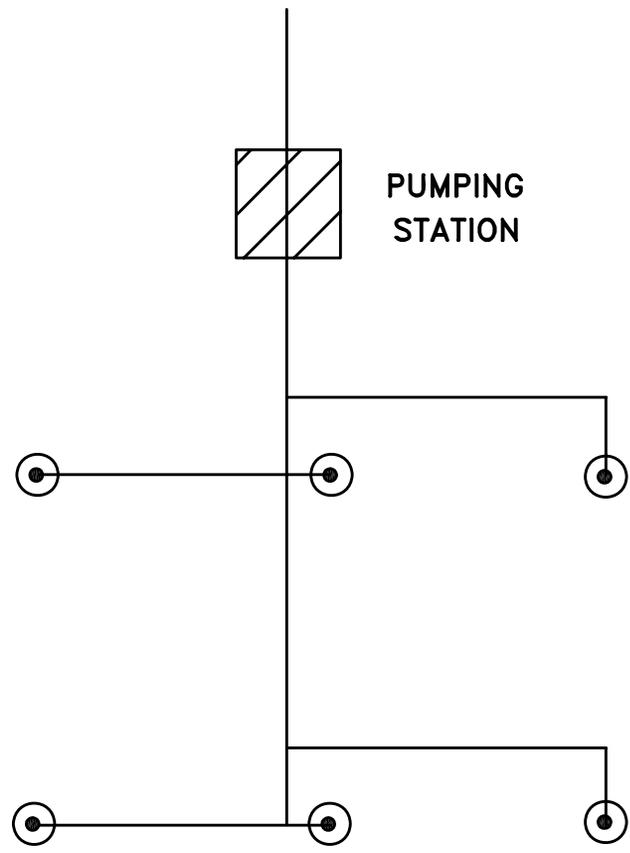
PLAN VIEW OF CONCEPTUAL RECLAIMED WATER ASR SYSTEM FOR NAPLES
